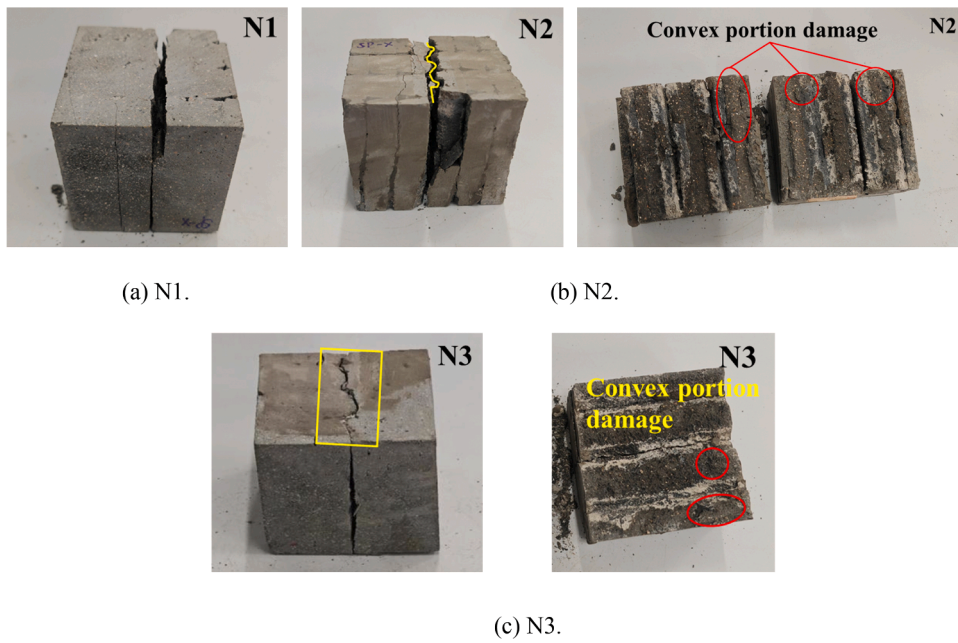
Failure mode of 3D printed concrete specimens (X direction).
